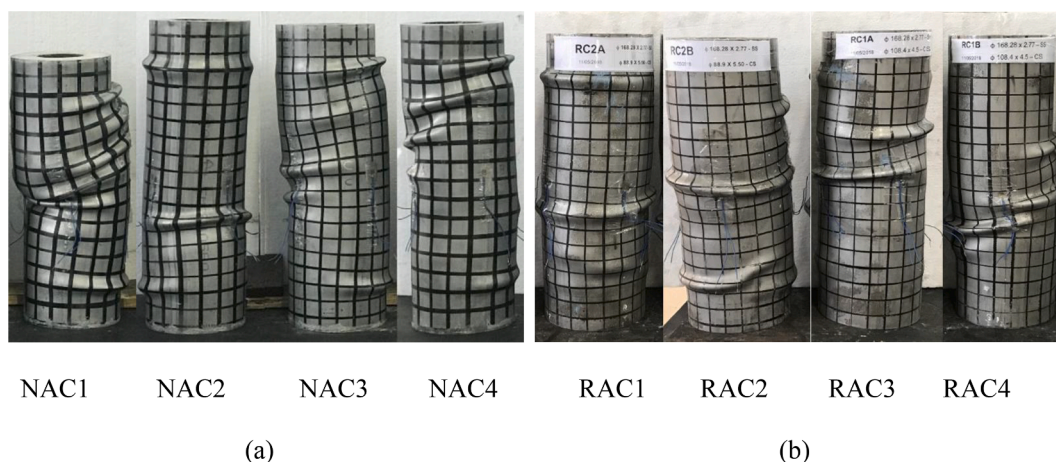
Specimens after testing showing outward-only local buckling of the outer stainless steel tube for stub columns with (a) NAC and (b) RAC infill.
